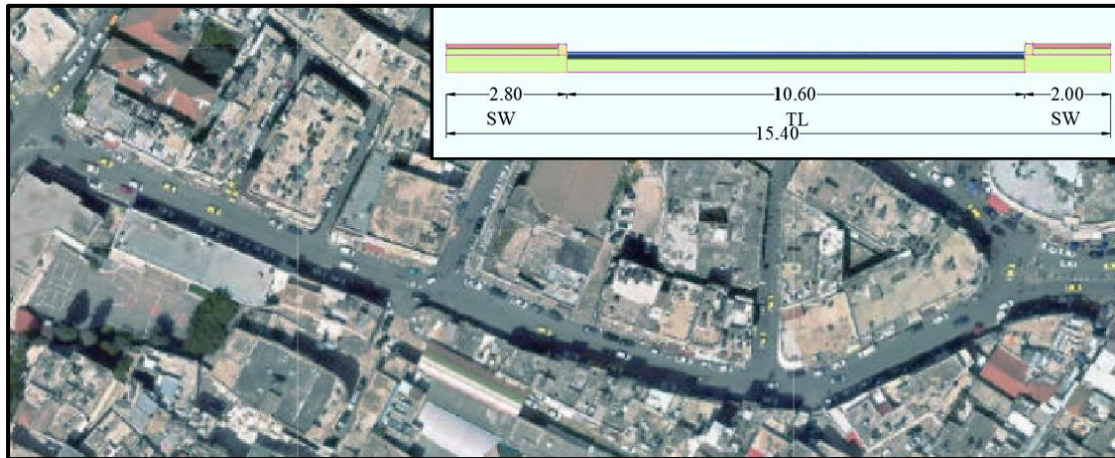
Ghernatah Street, Cross-Section Of The Street Elements.
